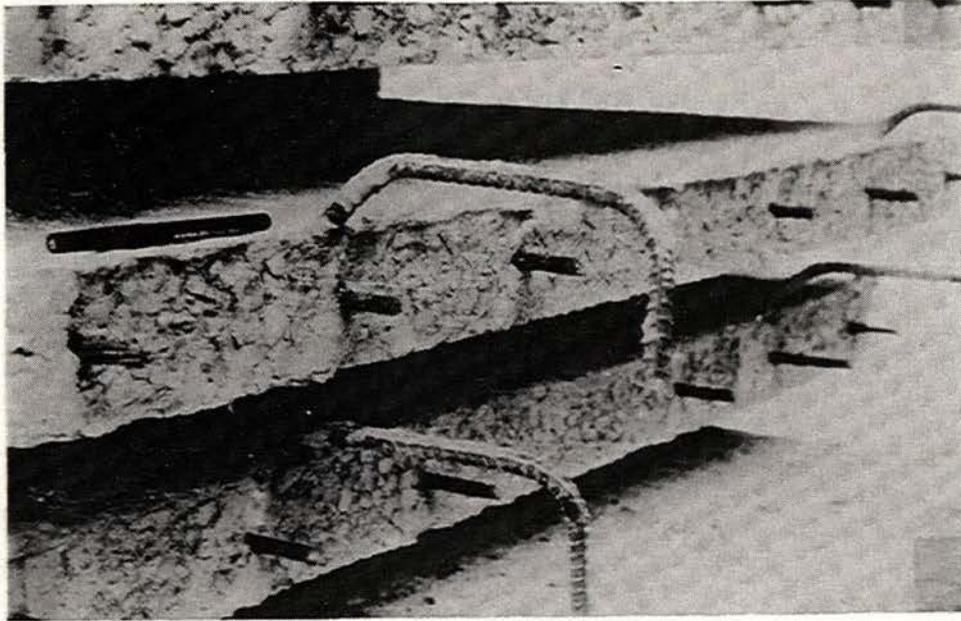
Hanger Bars for Precast Concrete Floor Units According to the New Zealand Guidelines [1]
